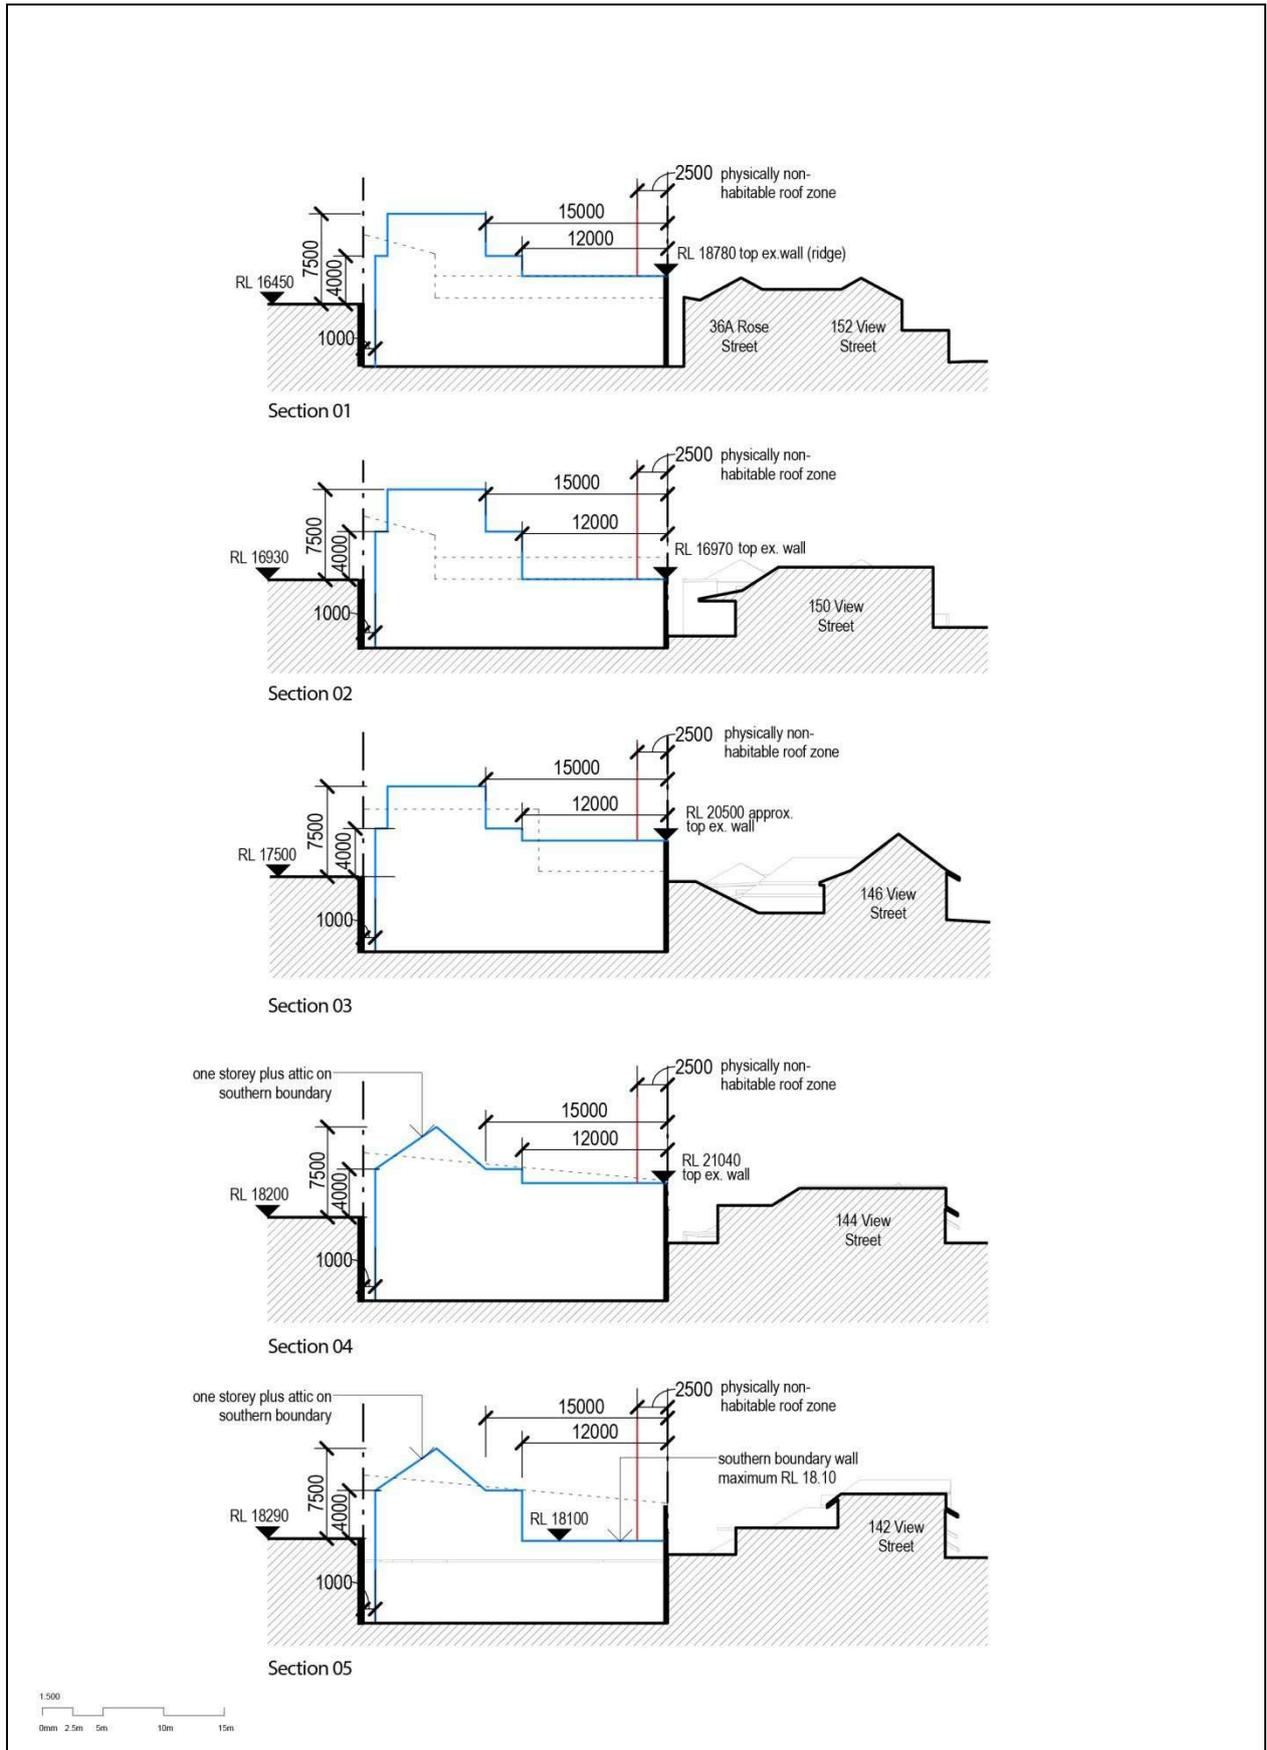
Building Heights and Massing Envelopes – Section 01, Section 02, Section 03, Section 04 and Section 05
